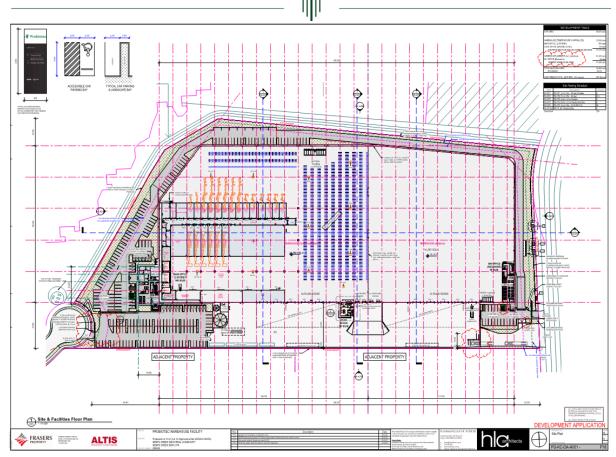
Proposed Amended Site Plan (Source: HLA Architects, 2023)
